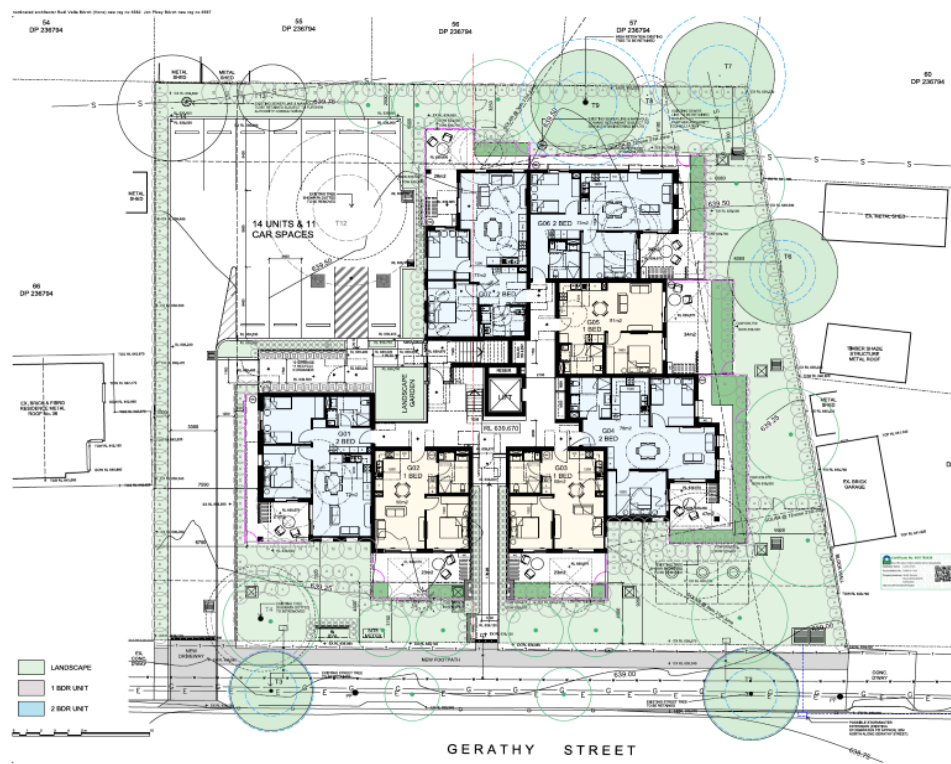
Extract from Architectural Plans – Ground Floor Plan (Source: DEM (Aust), dated 14/03/2025)
